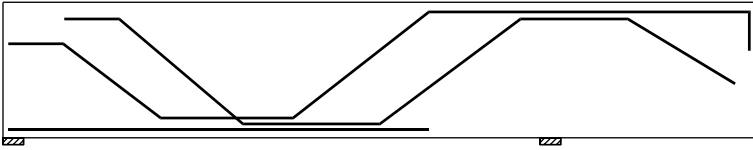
Layout of main steel reinforcement in the continuous beam.
